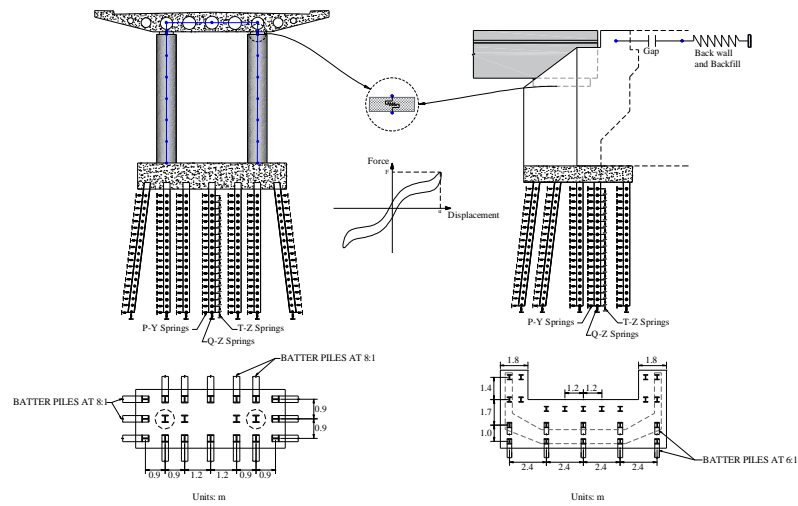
Plan and elevation view of piers, abutments, and their supporting pile groups
